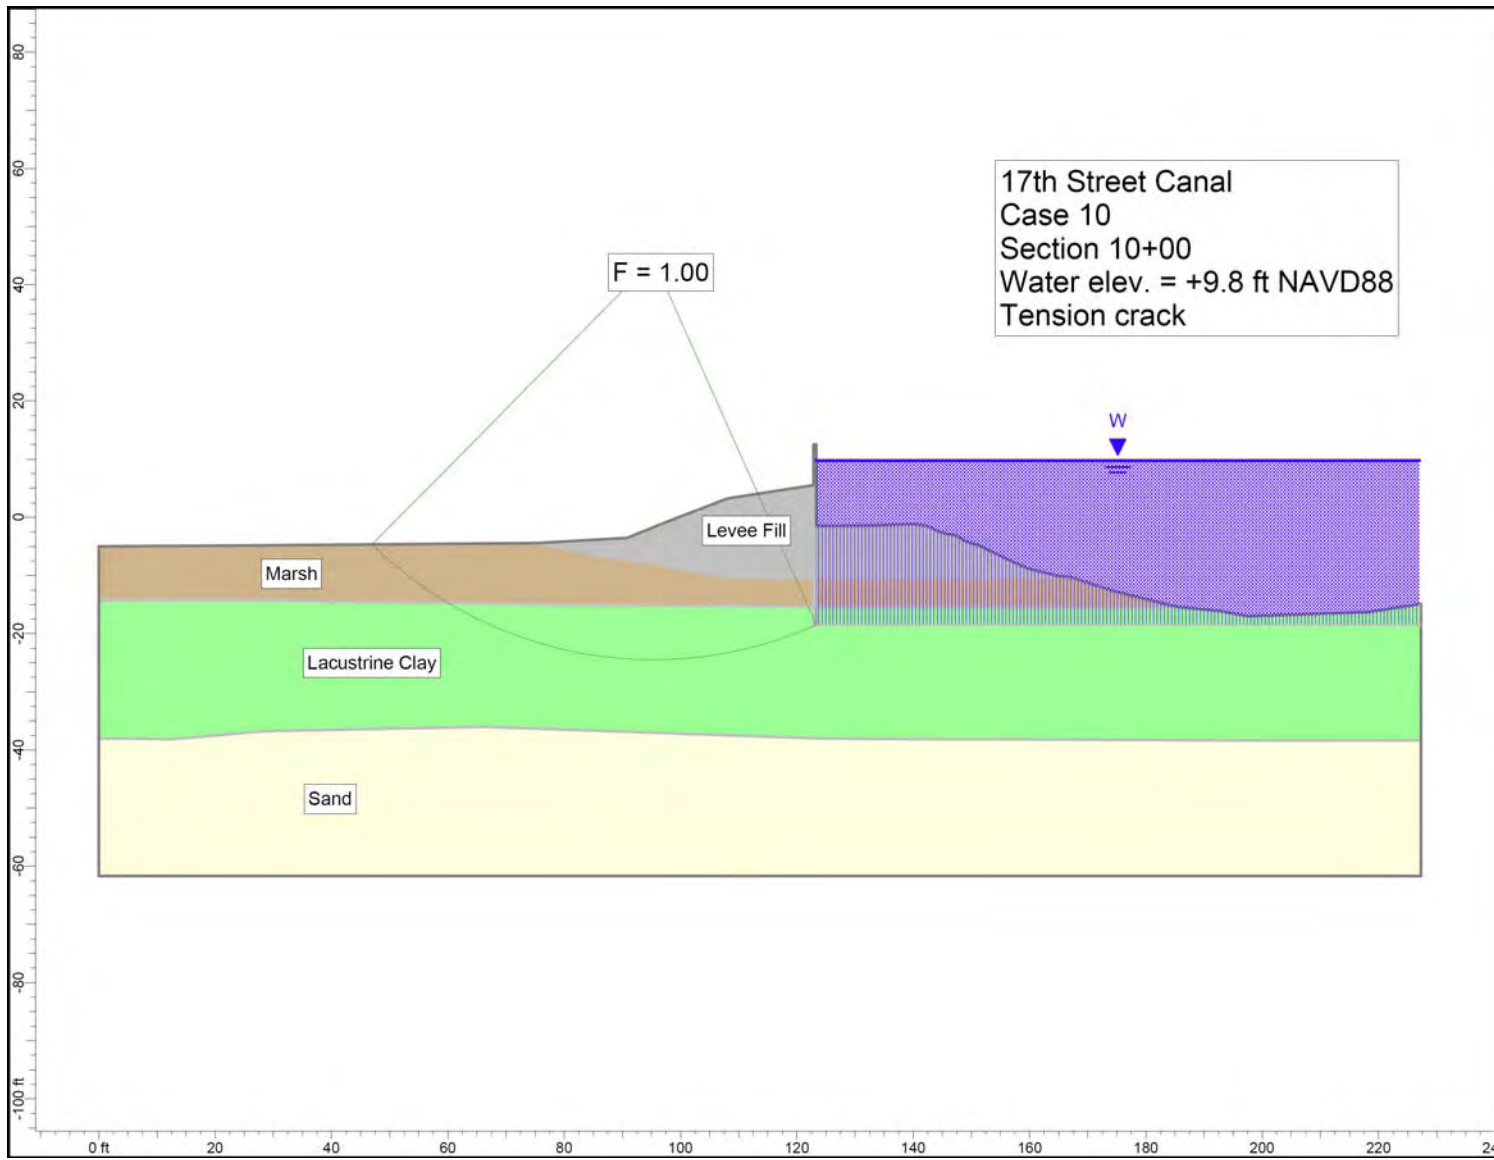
Critical Circle for 17th Street Canal Station 10+00 – Water Elevation 9.8 ft, Tension Crack
